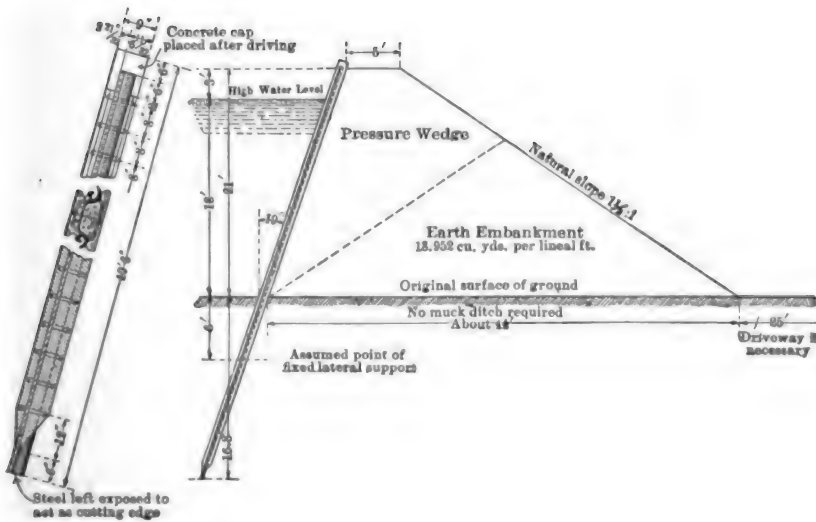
LACKAWANNA SHEET PILE LEVEE WALL.
